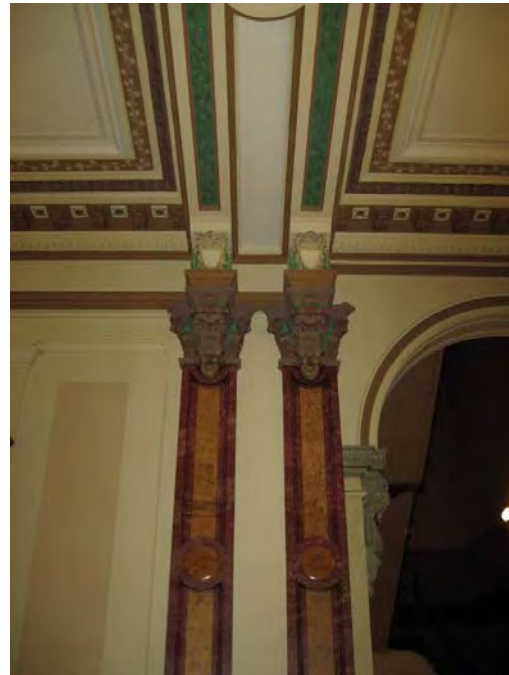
Wrought iron beams supporting floor of third floor corridor, bearing on cast iron pilasters seen on the second floor.
